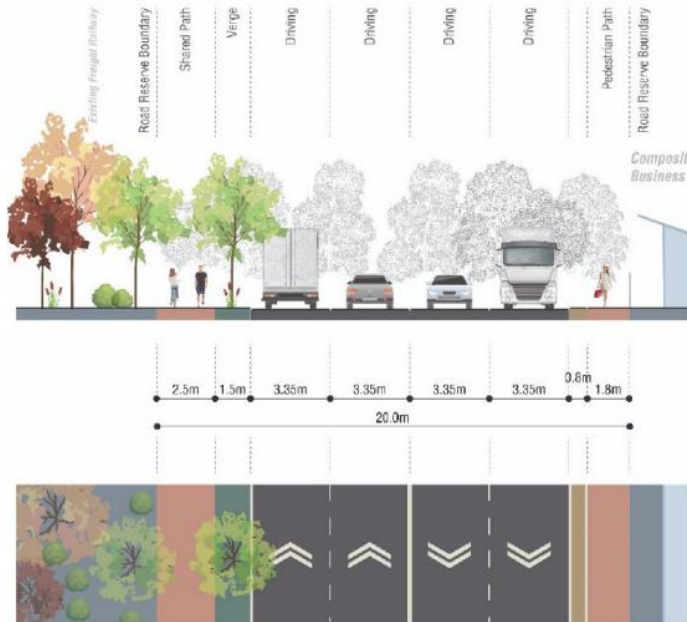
and Figure 6-4 show proposed cross sections for Dundas Road as part of the High Wycombe South TOD Activity Centre Structure Plan. These do not indicate on street parking is to be provided.
